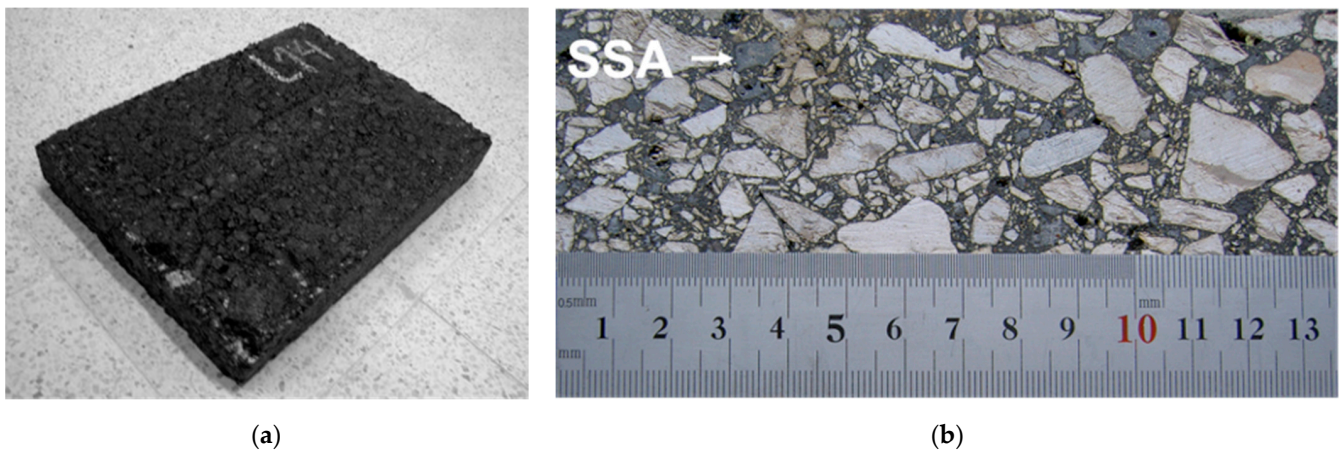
Prismatic specimens: (a) general view; (b) detail of the cutting face.
